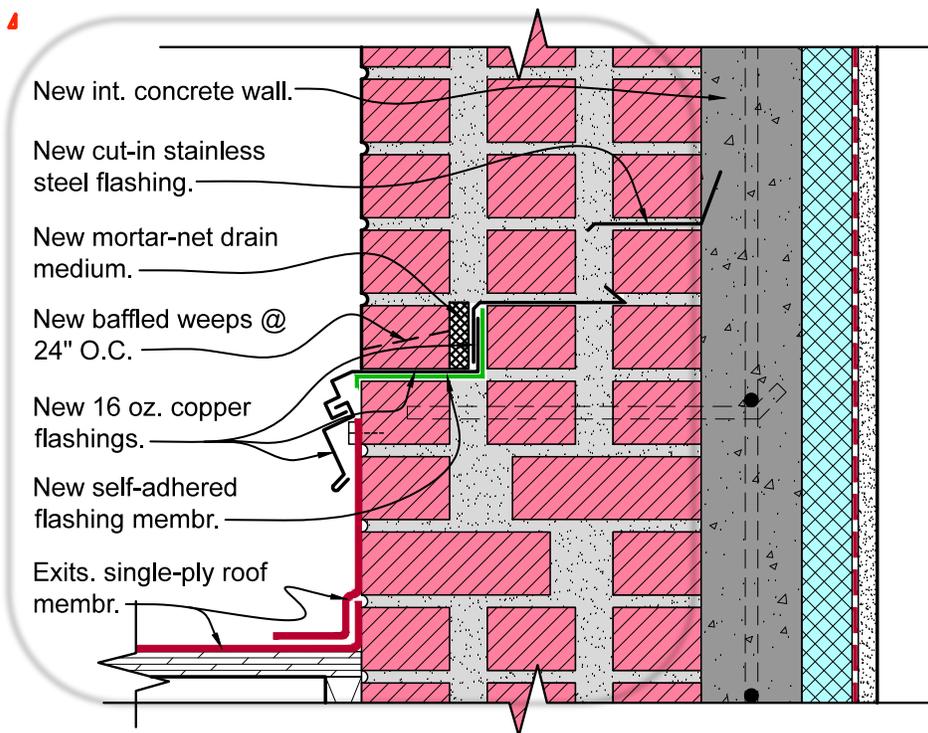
(2): Recommended Modifications at Roof-Brick Wall Junctures
